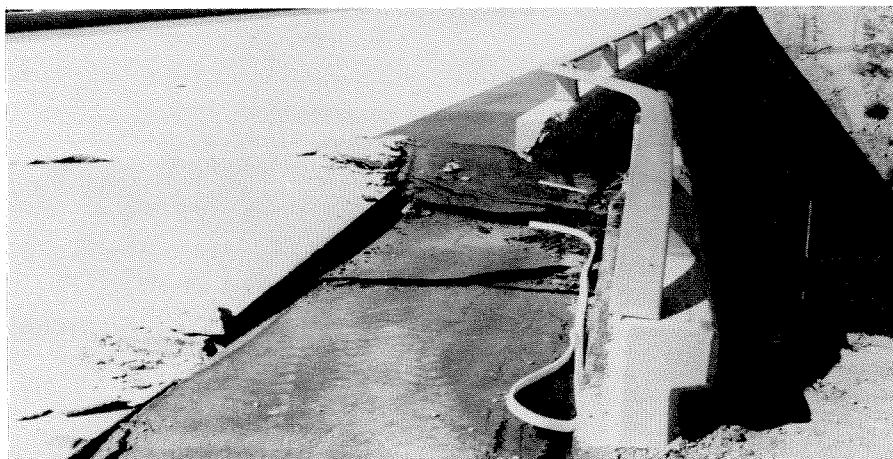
Eastern abutment of the southern bridge of the Roxford Street undercrossing, Foothill freeway.
